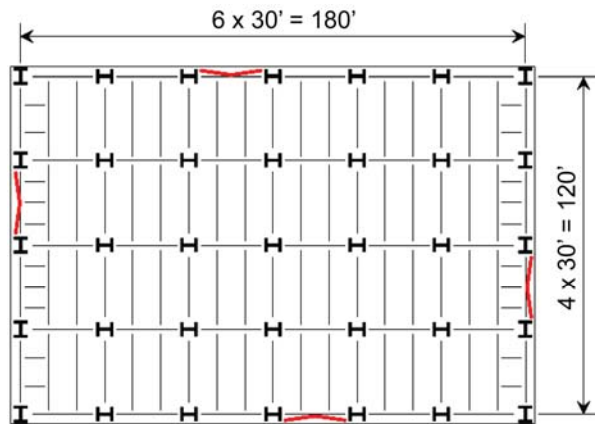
Plan configuration of 3-story and 6-story braced frame archetypes.
